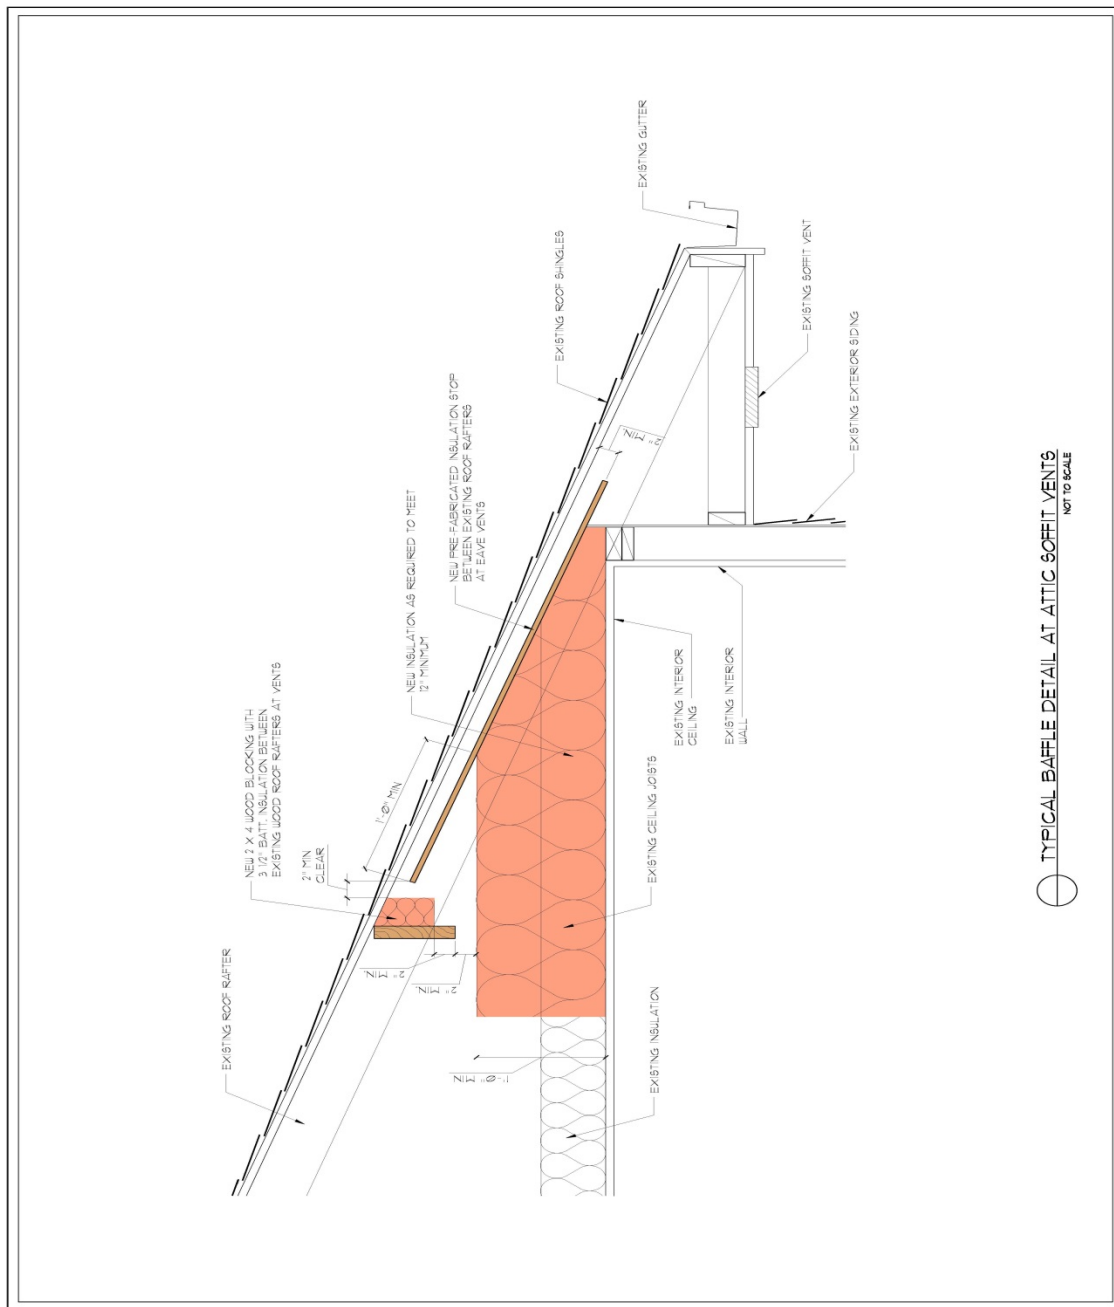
Typical Baffle Detail at Attic Soffit Vents
